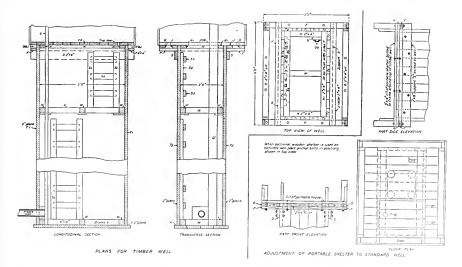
Construction Drawings of the Standard Timber Well Box Used in Connection with the Shelter Shown in Fig. 2.
